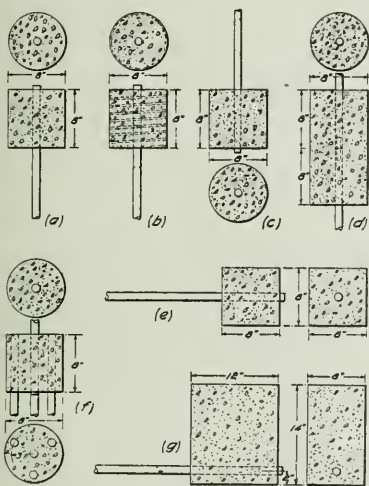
Types of Pull-out Specimens Used in the Tests.
